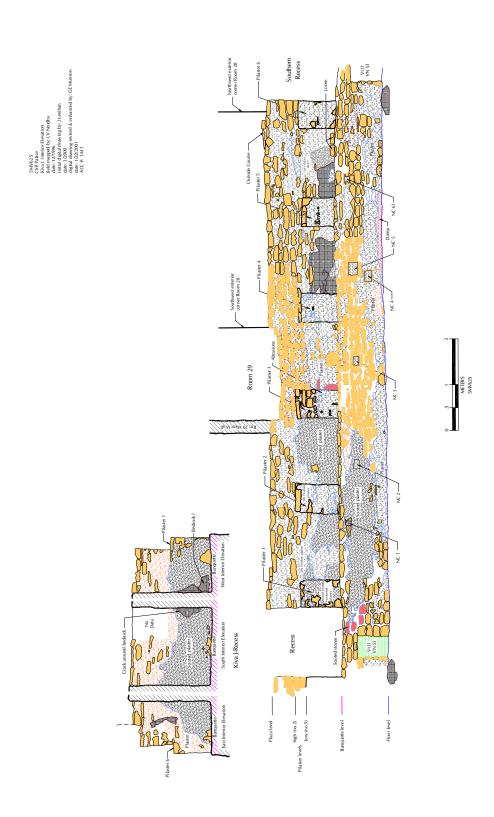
Cliff Palace-Kiva J Interior Elevation.
